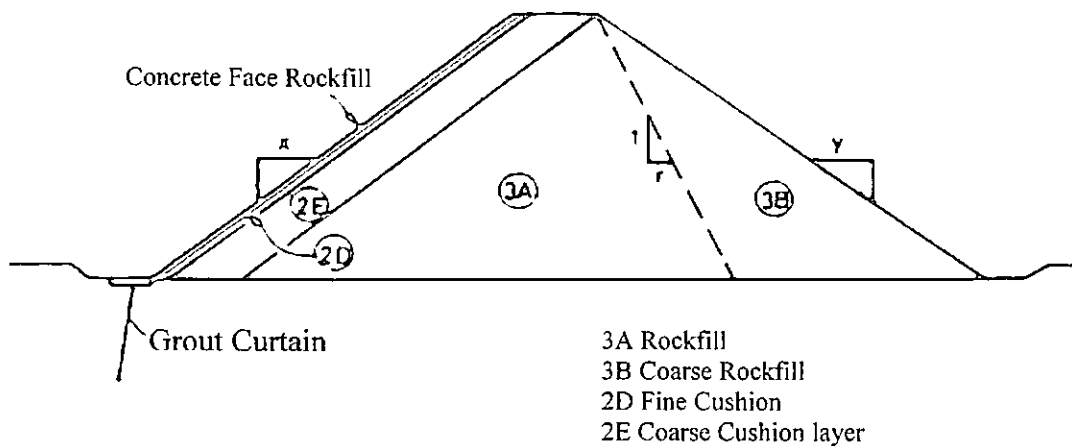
Type of Concrete Face Rockfill Dam (Robin et al., 1992)
